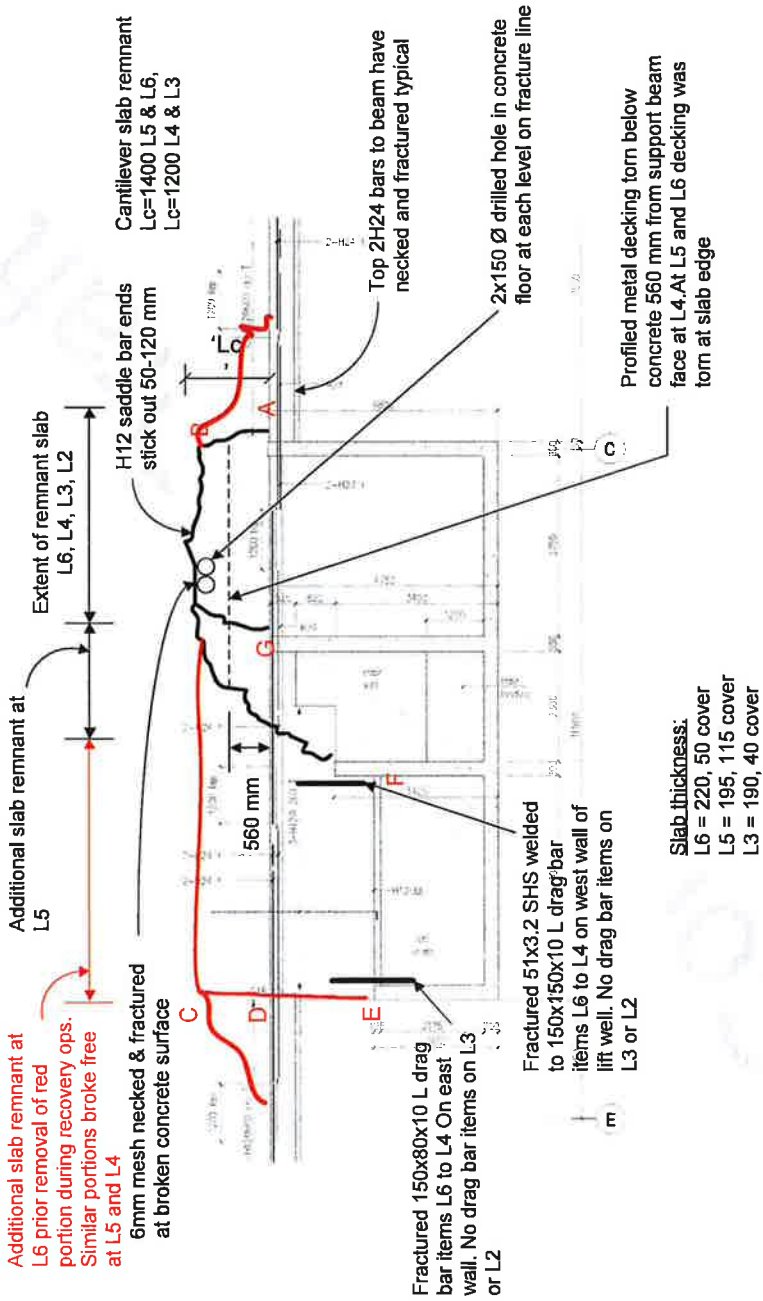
North Core slab remnants after collapse based on site measurements in black and inferred by collapse photos in red..
